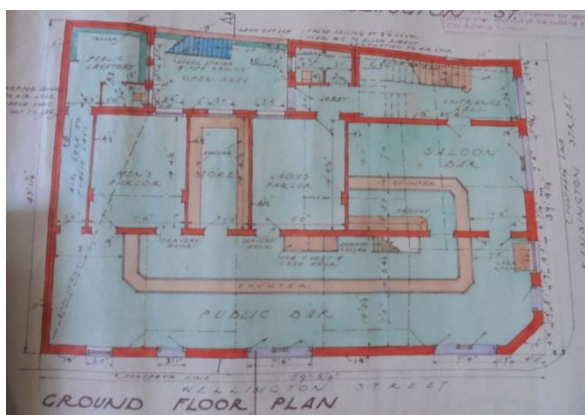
PLANS OF THE NEW CASTLE CONNELL HOTEL WELLINGTON & KENSINGTON STREETS, CHIPPENDALE, 1936
